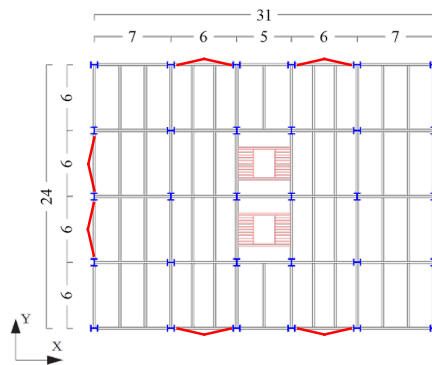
Plan layout of the six-storey building - Dimensions in meters
